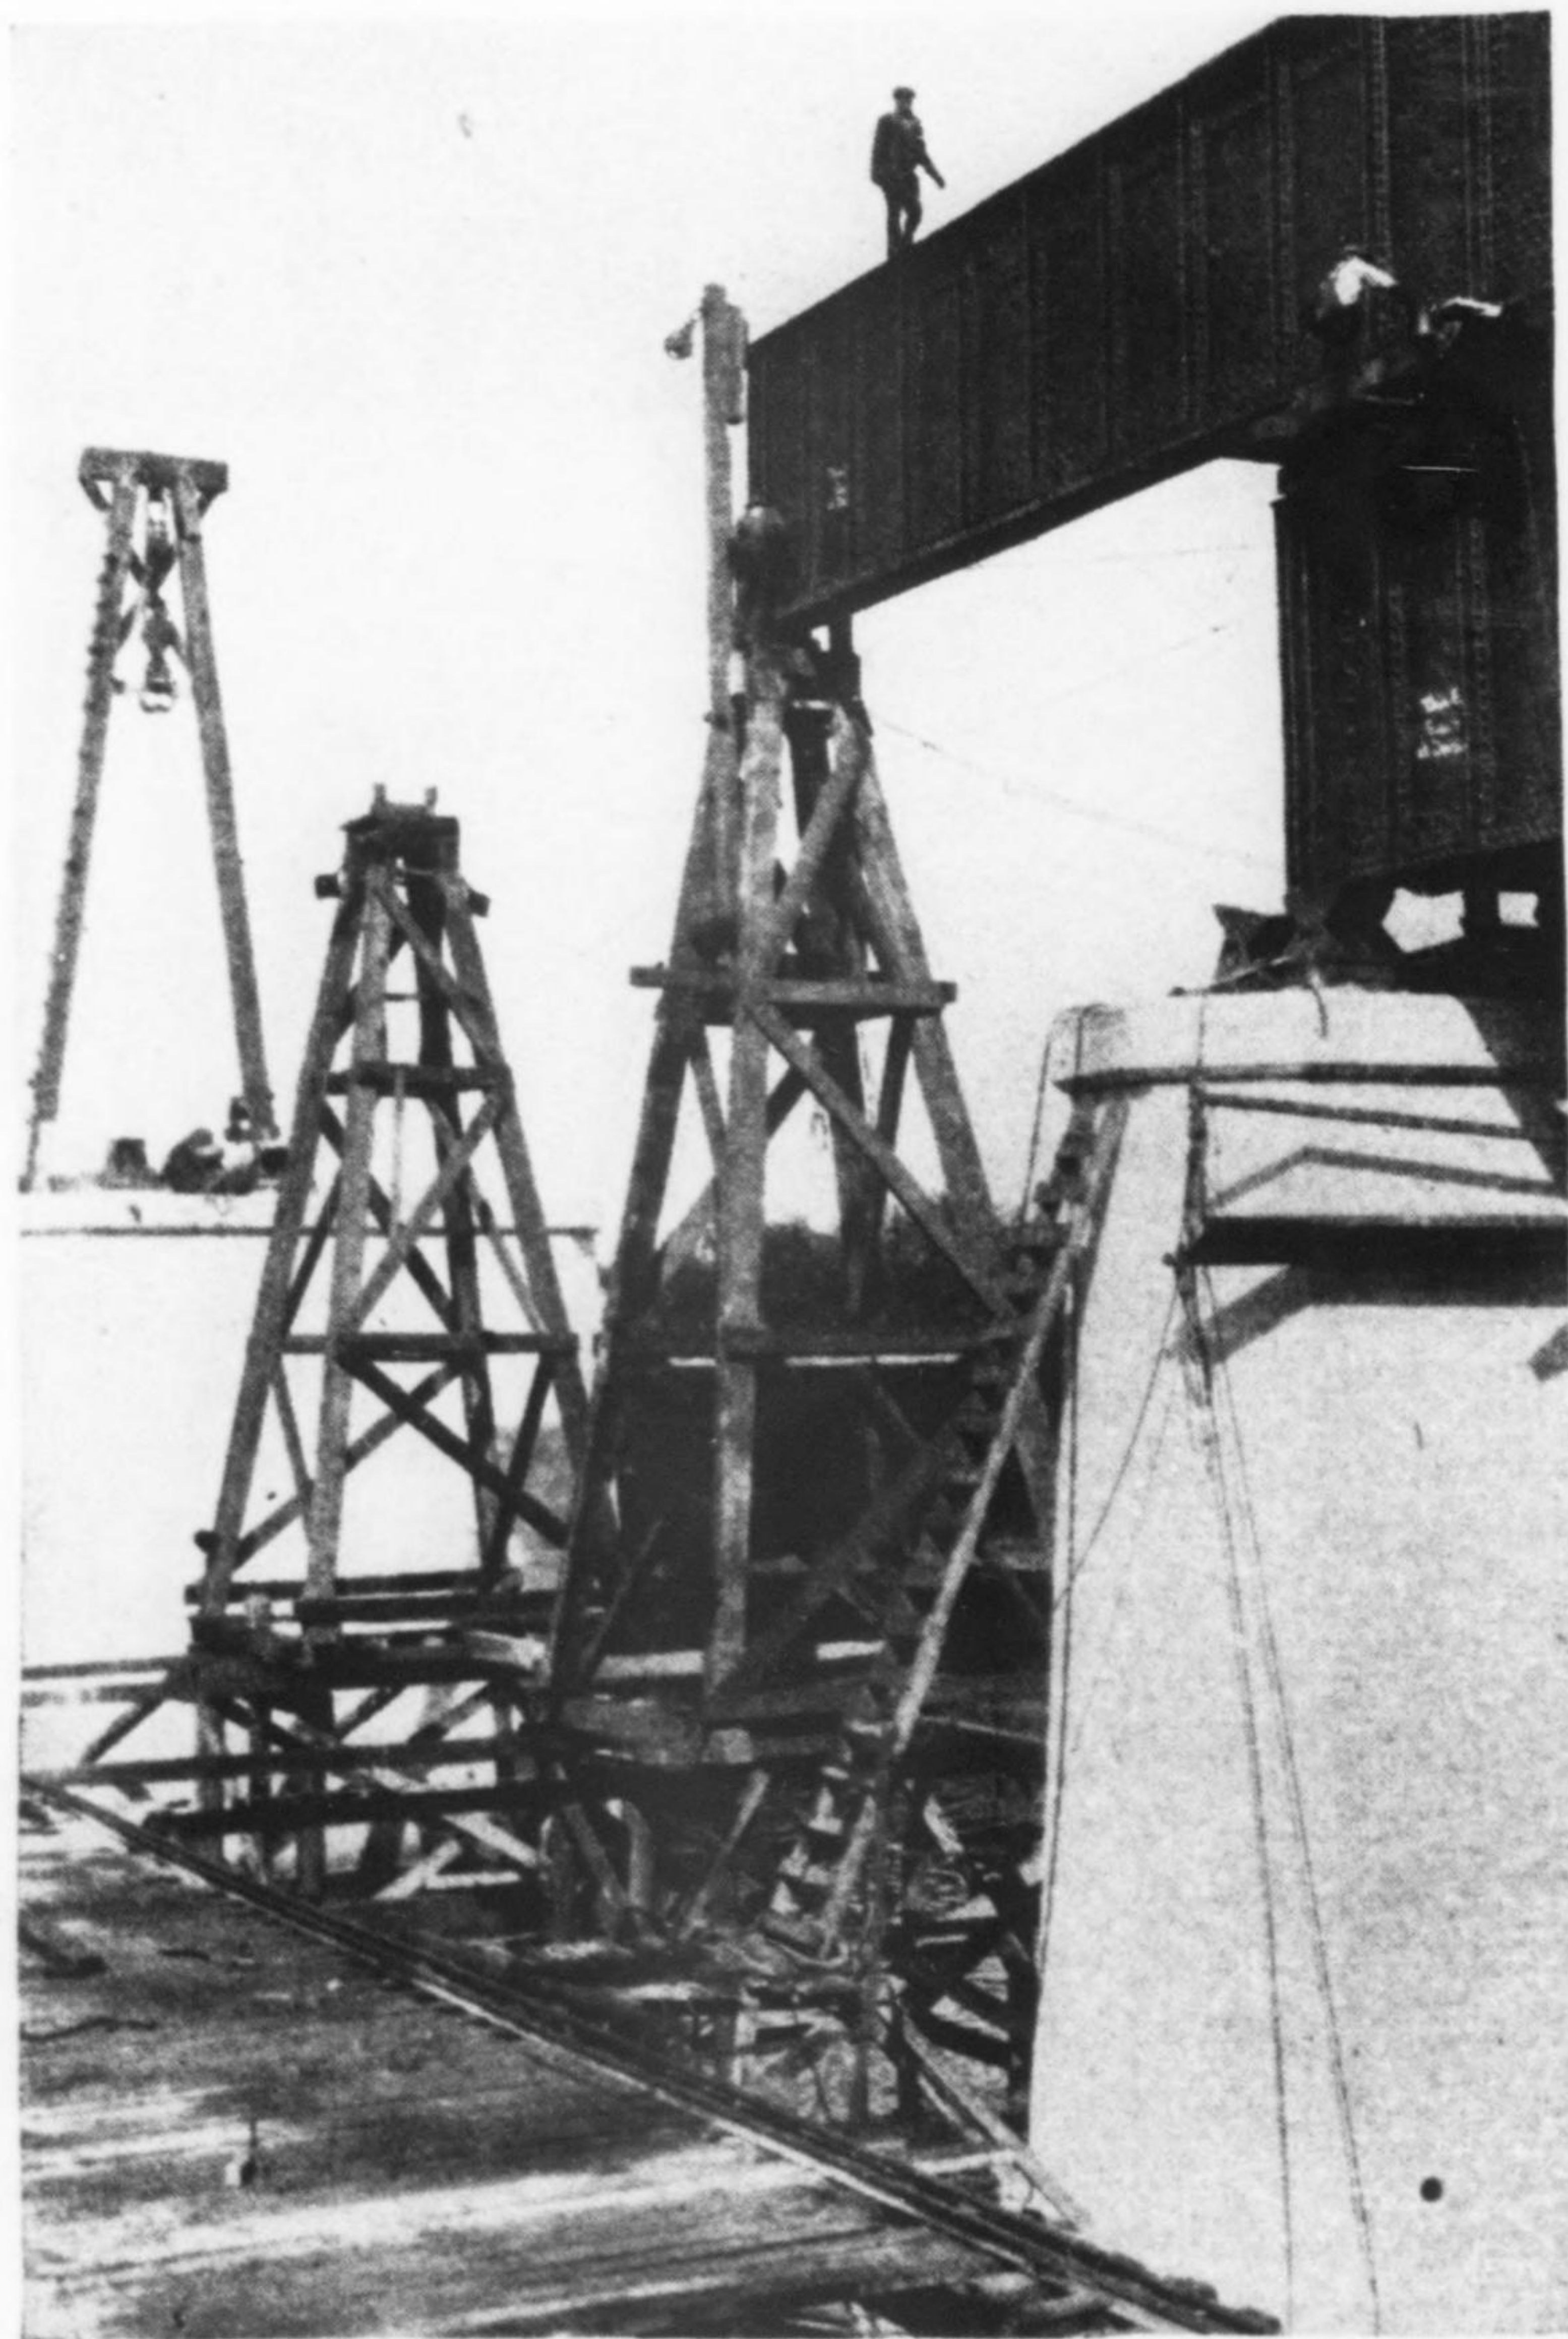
LAUNCHING GIRDER FOR RIVER SPAN
